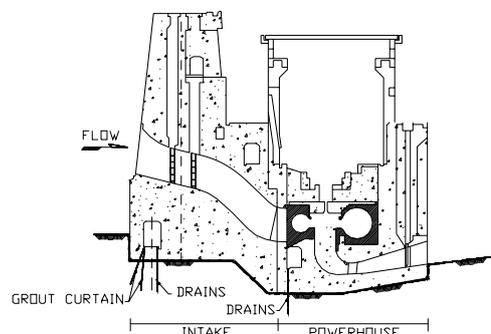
Typical cross section of block 2 of the intake and powerhouse structures of Isamu Ikeda dam
